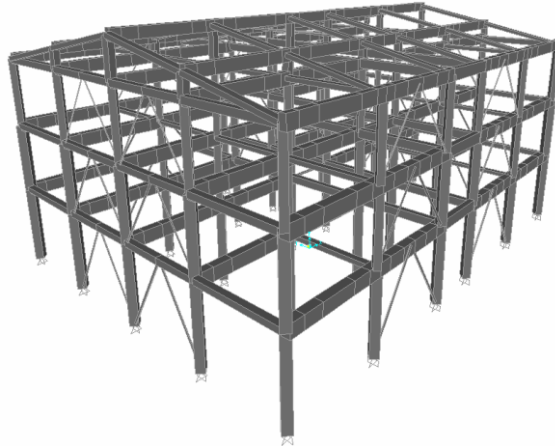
STEELRETRO reference benchmark RC building model and BRB system distribution
